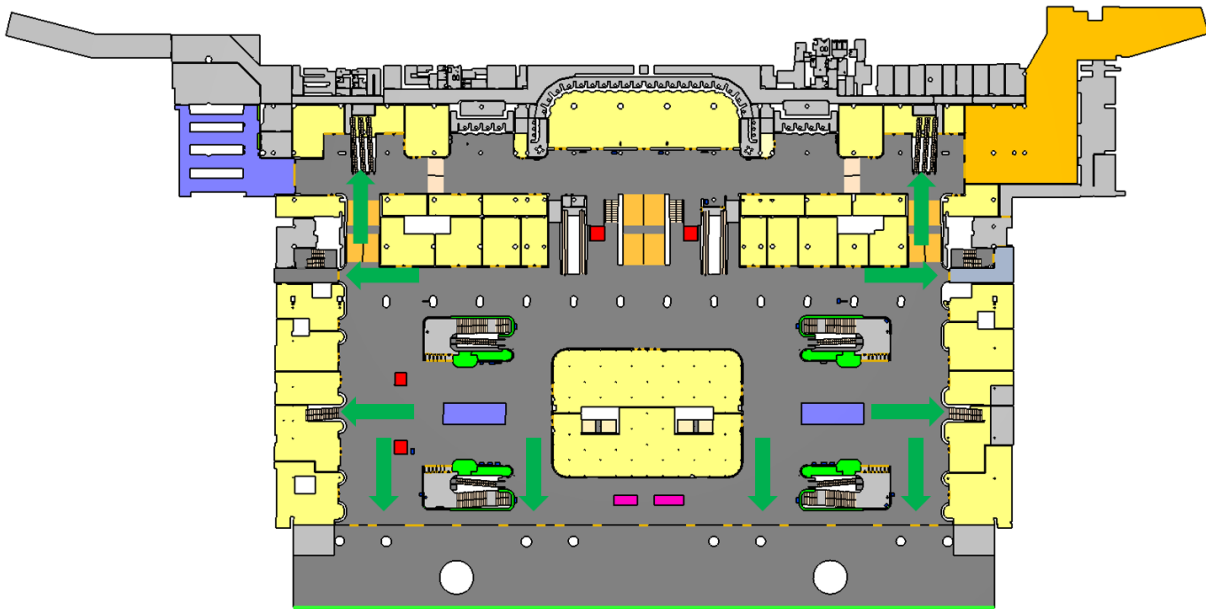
The floor plan of the Prague Main Railway Station with the evacuation routes.
